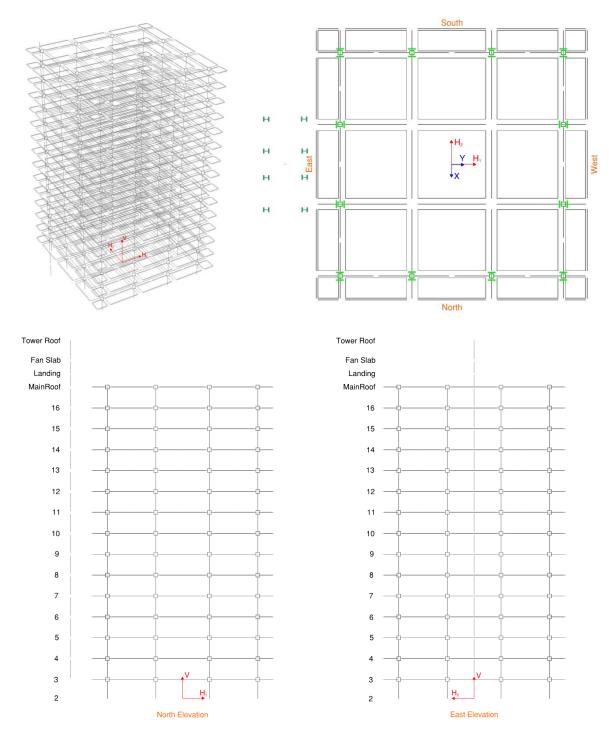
Perspective, plan and elevation views of the Perform-3D model.
